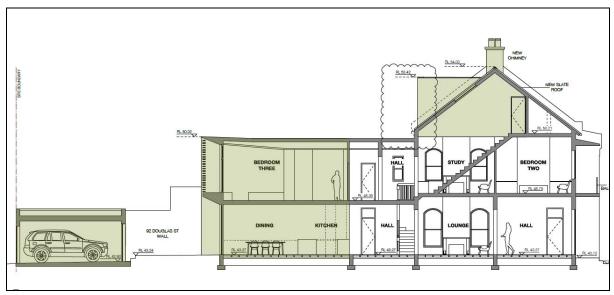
Approved Works - Section Plan - No.94 Douglas Street, Stanmore
